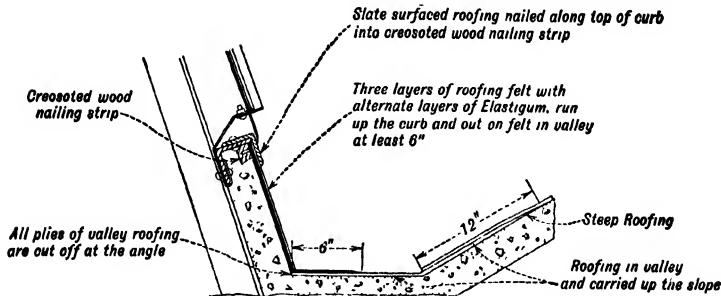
Details of Roofing for Sawtooth Roof. (See p. 677.)
